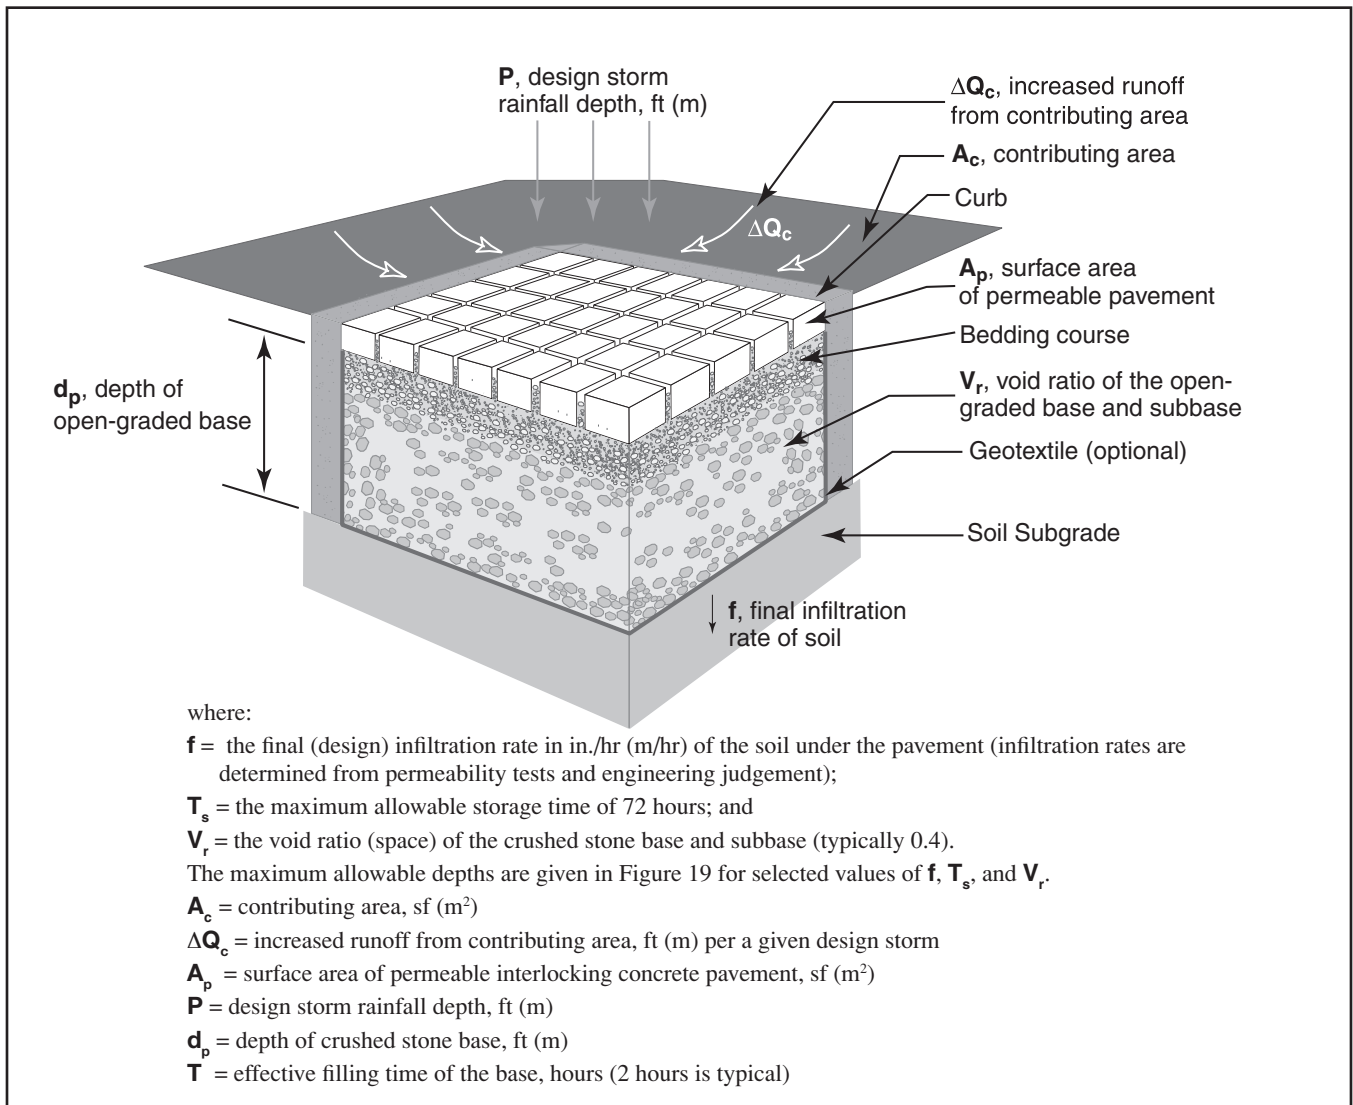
Design parameters for calculating the base depth for permeable interlocking concrete pavements.
